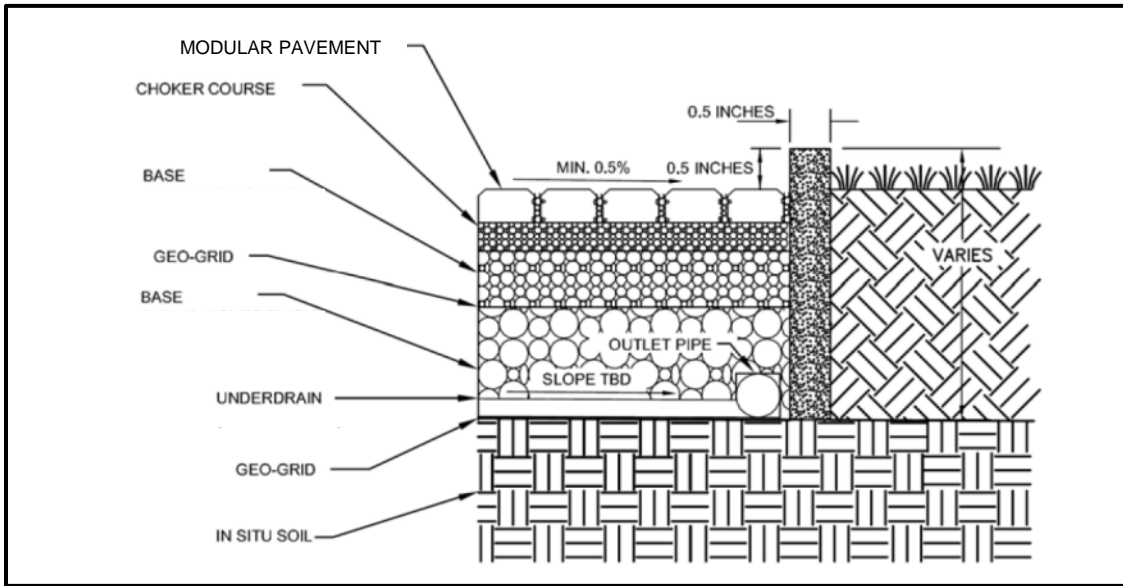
Modular Pavement With Underdrain System (from LJCMSD, 2009).
